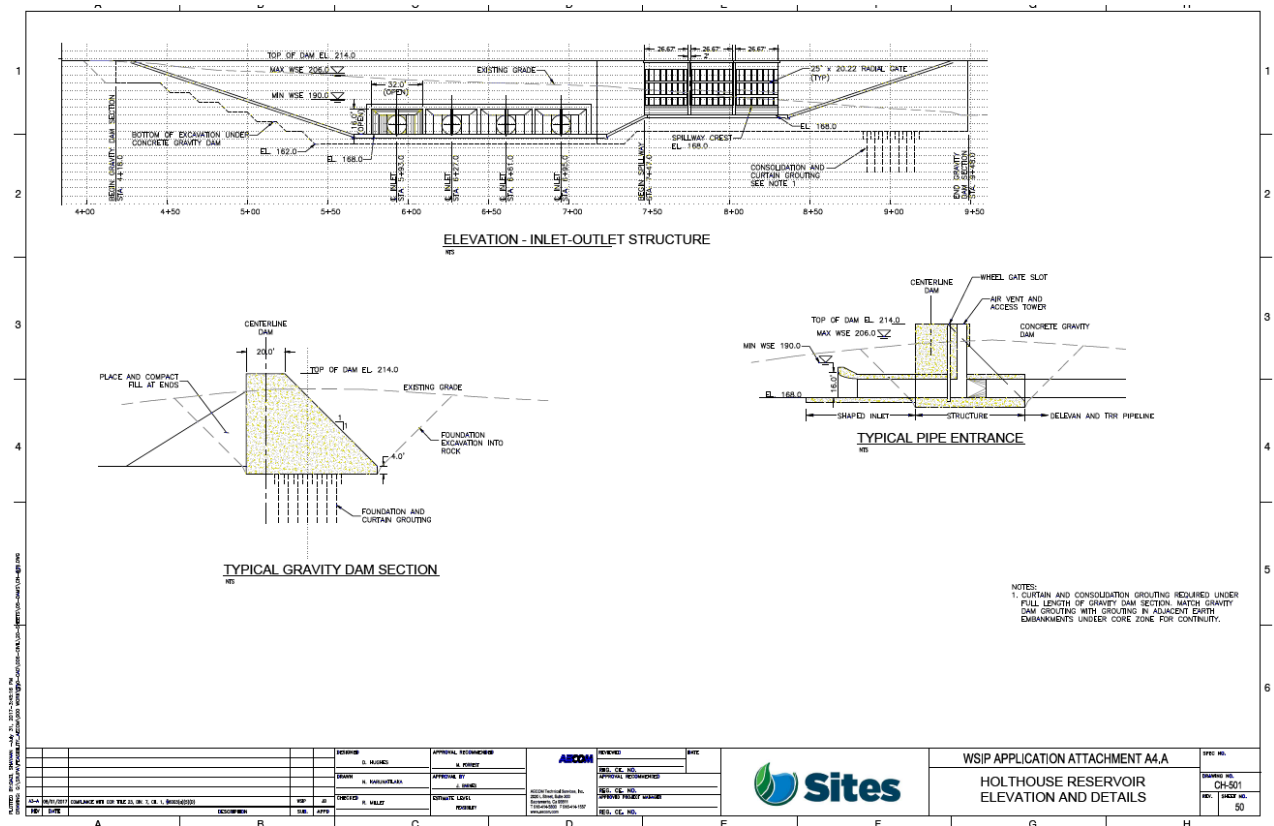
Holthouse Reservoir Inlet/Outlet Elevation and Sections
